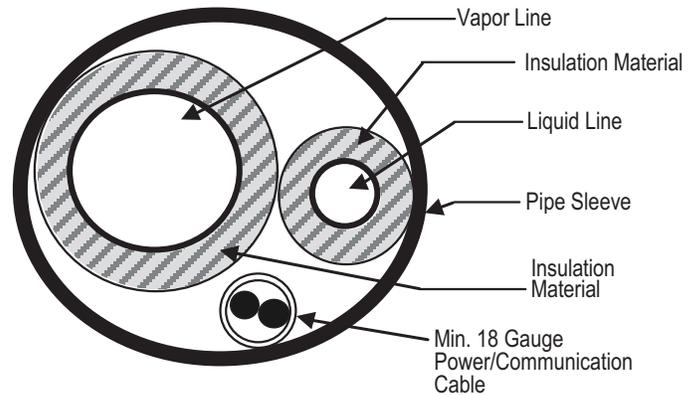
Hydro Kit Refrigerant Piping Insulation Close Up.
